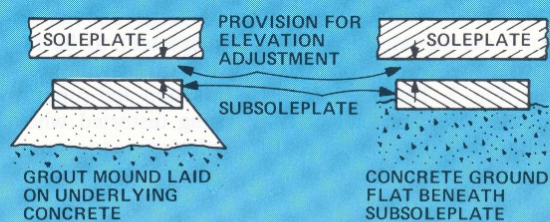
Subsoleplate is set to leave about $\frac{1}{8}$ in. of space for shims to permit final adjustment of the soleplate flush with the floor.
